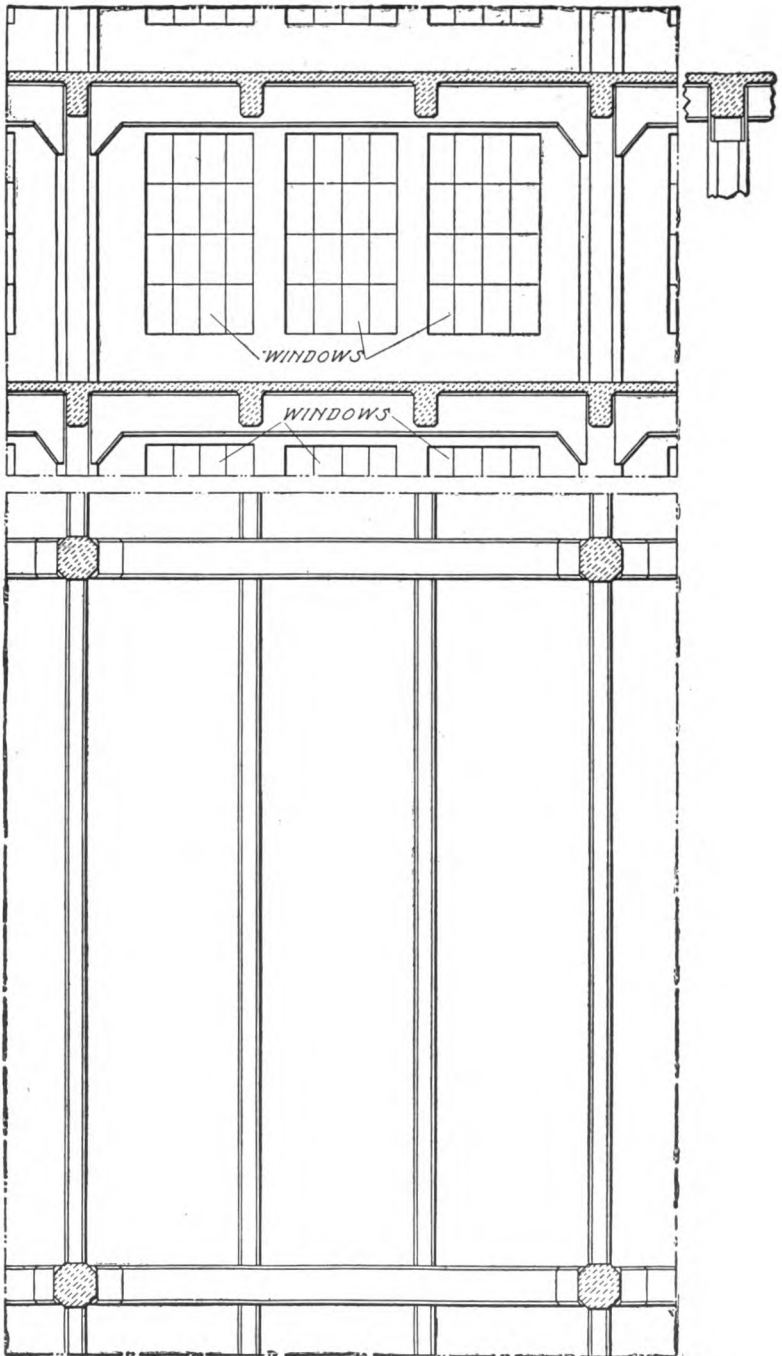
Detail Diagram of Concrete Construction of the Wooden-Floor Type
